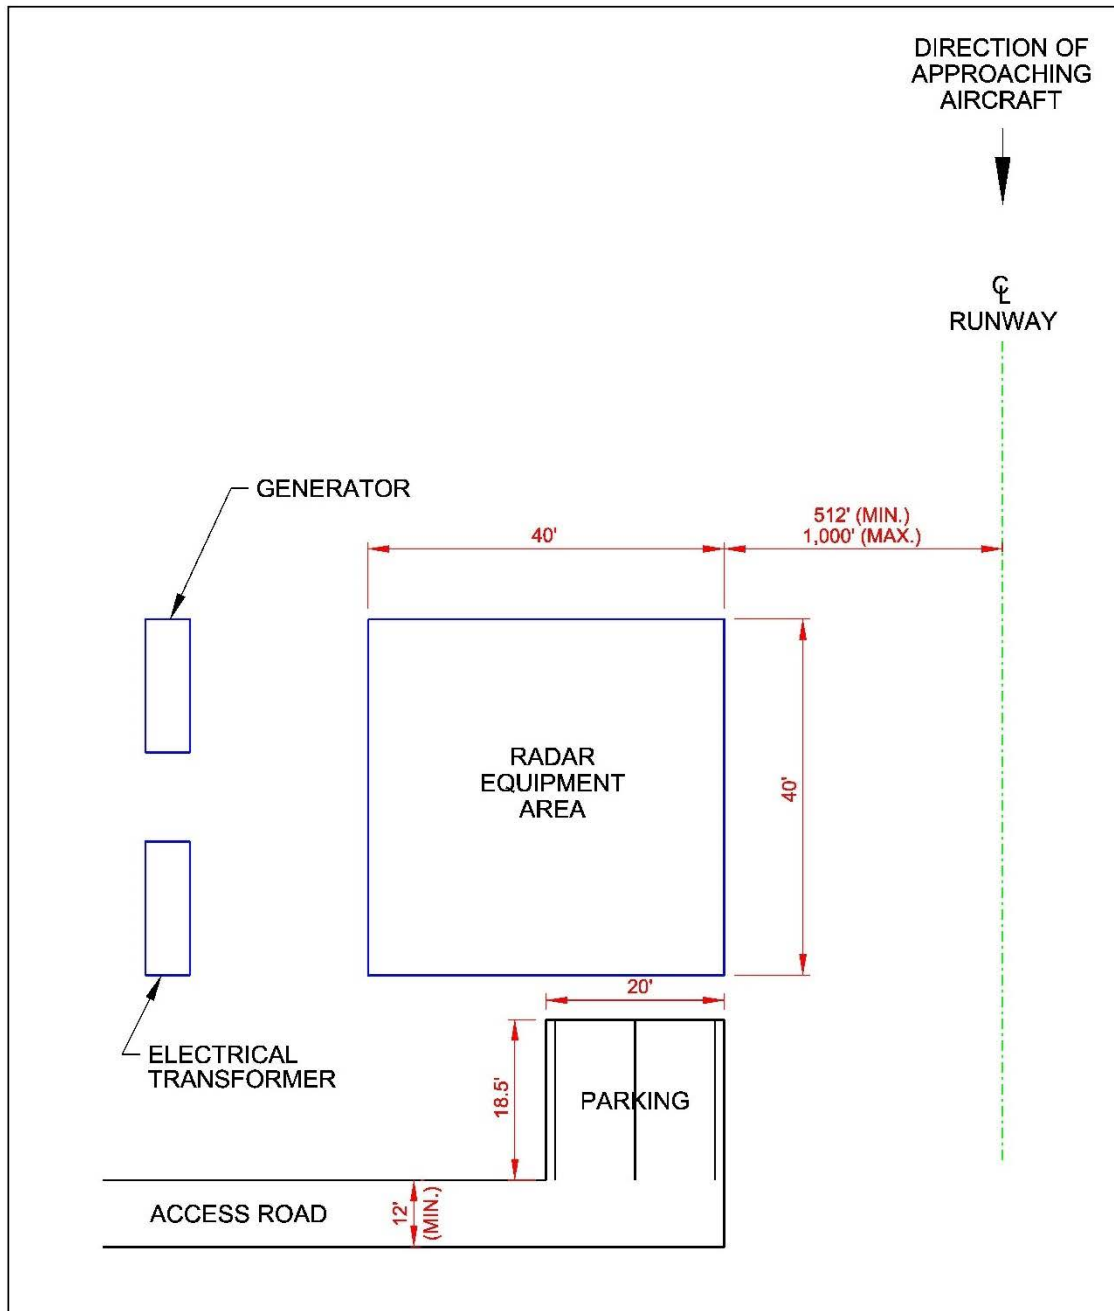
PAR Facility: Turntable Mounted Radar Plan and Elevation
